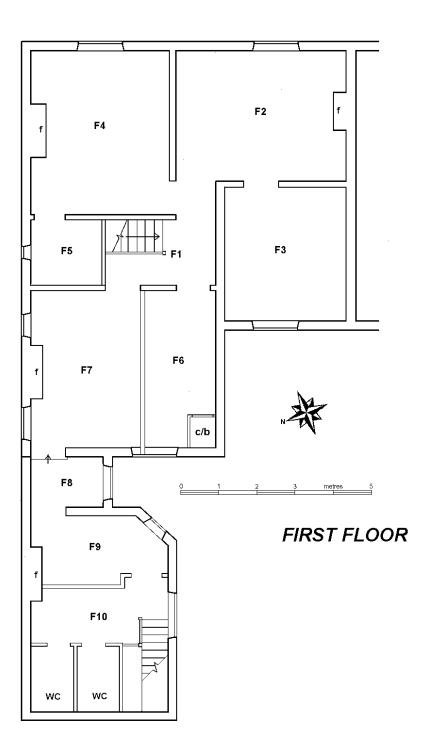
48 Diglis Road, floor plans (scale 1:100)
